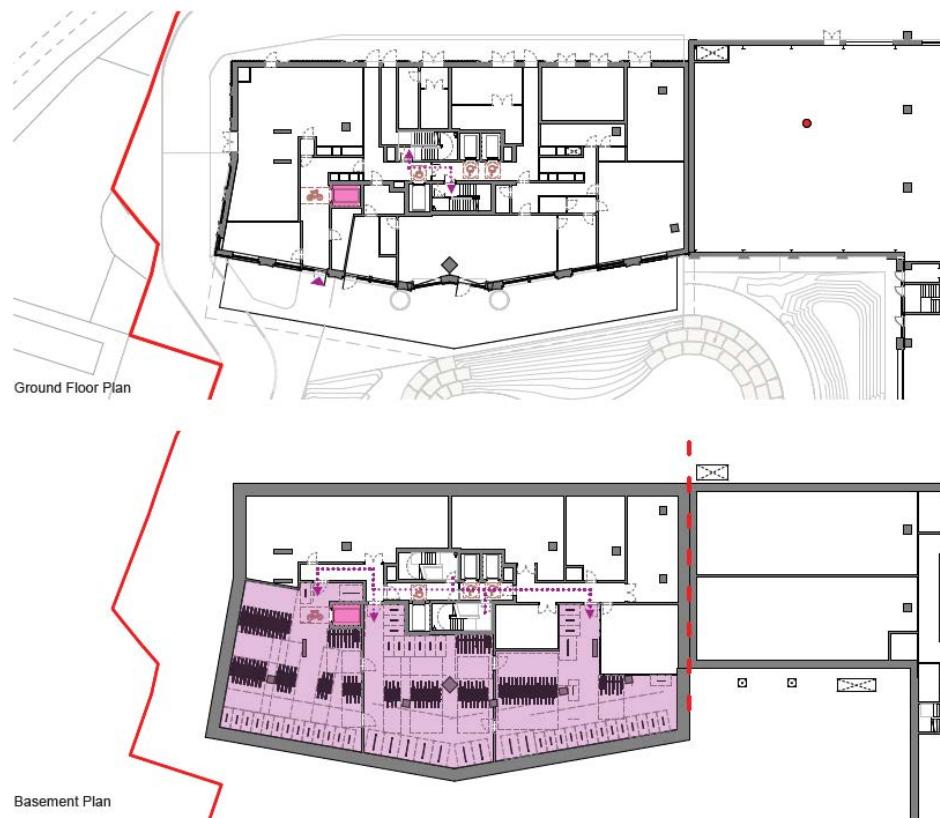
Example of basement cycle parking and access in Block B1 (tower)
